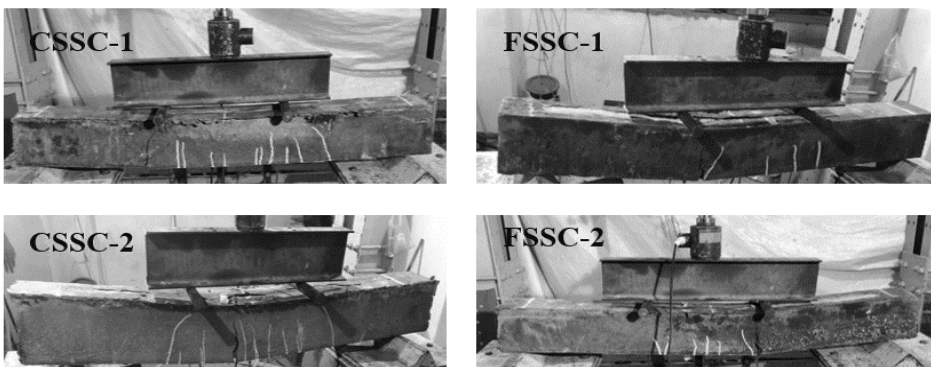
Failure Mode of Control and Fire Damaged Beams Strengthened with UHPFRCC
